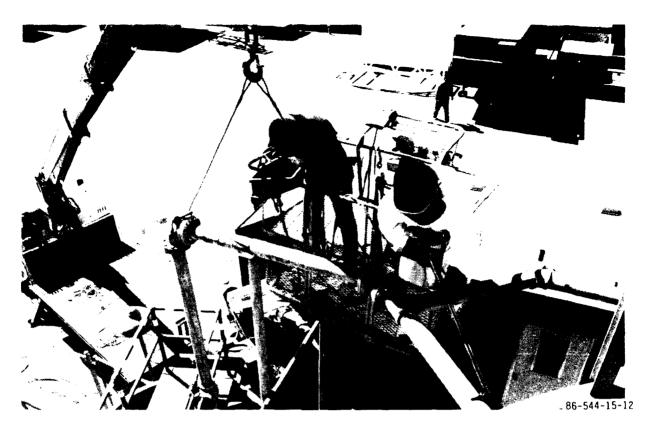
Piping near the northwest corner of the IWTP-4 north section being rigged for hoisting to the ground.
